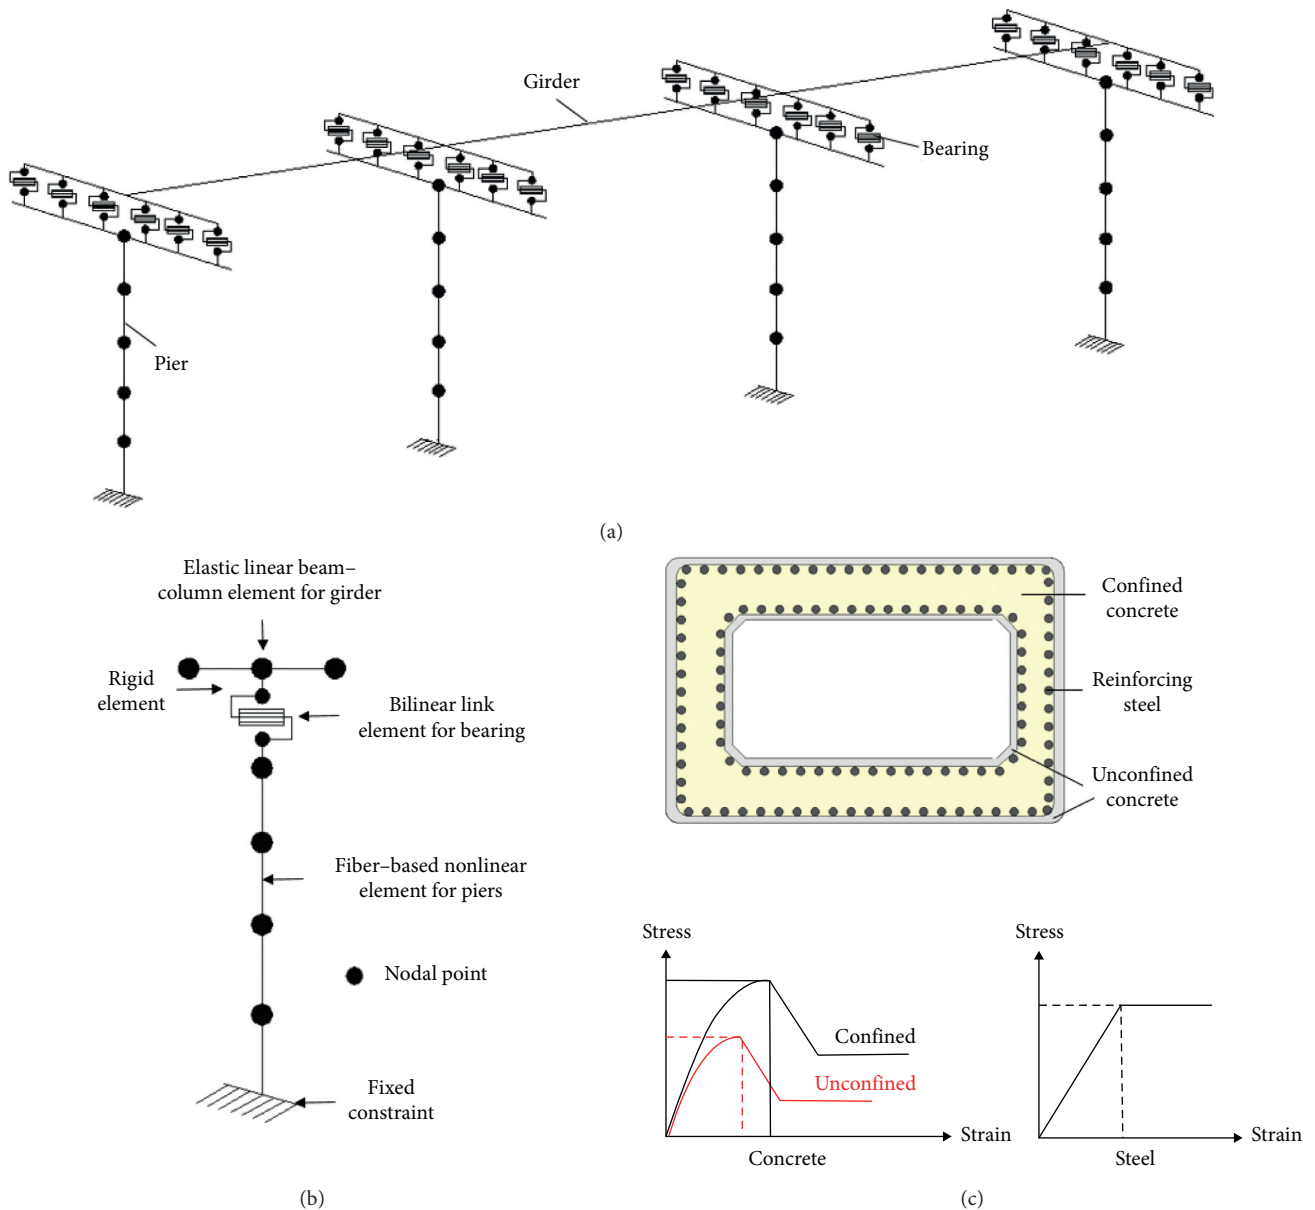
Analytical model: (a) 3-D finite element model of the total bridge system (girder and deck elements are not shown for clarity); (b) modeling details of an external bridge pier including the nonlinear model used for bearings; (c) details of the fibre-based nonlinear elements used for the pier sections.
